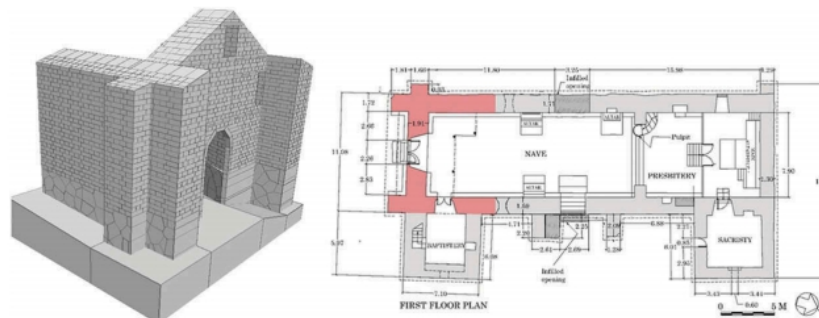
Geometry of the façade and longitudinal wall in 3D (Mendes et al., 2020)
